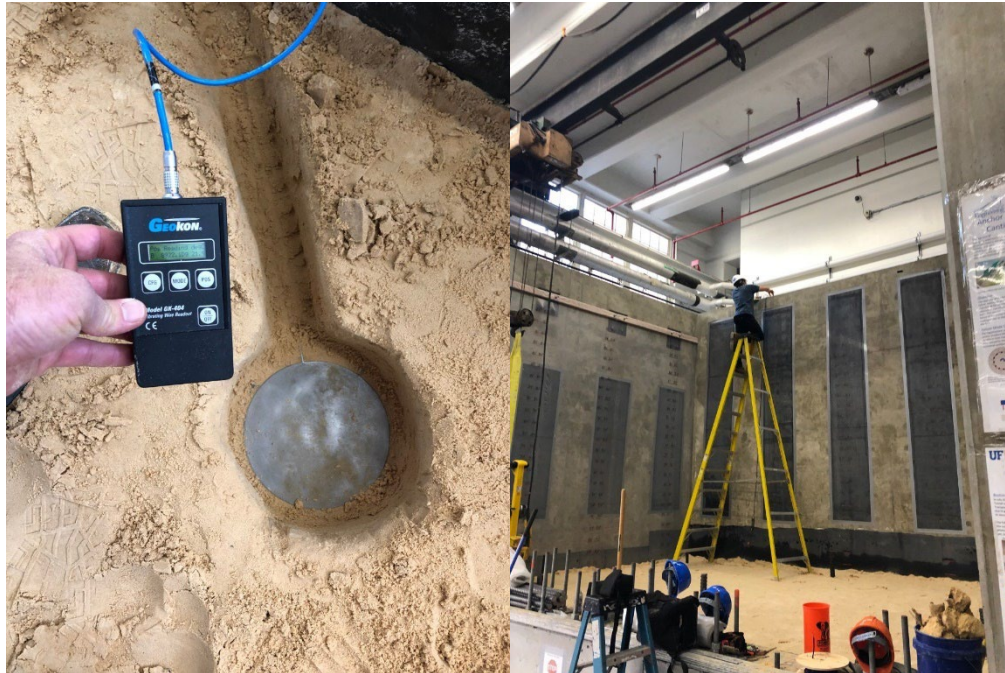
Placing EPCs under leveling pad locations and testing using handheld readout.
